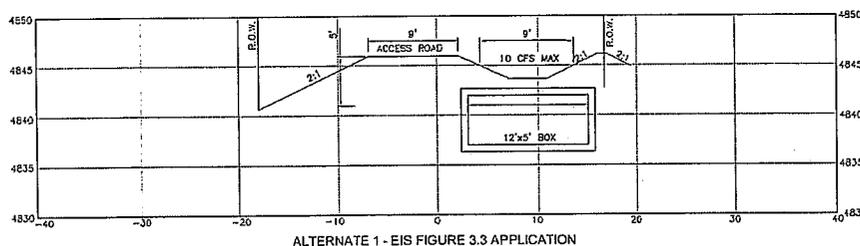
Typical Cross-Section B: 12-foot-wide by 5-foot-deep box culvert at about 1200 North in Logan (looking downstream)
